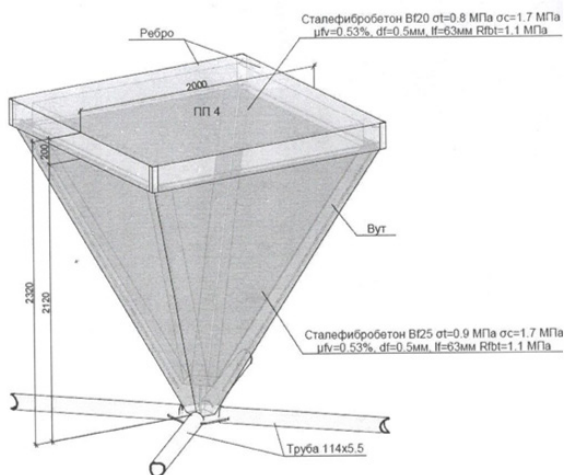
Pyramidal element of a hybrid structural pavement with geometric and fiber reinforcement parameters
